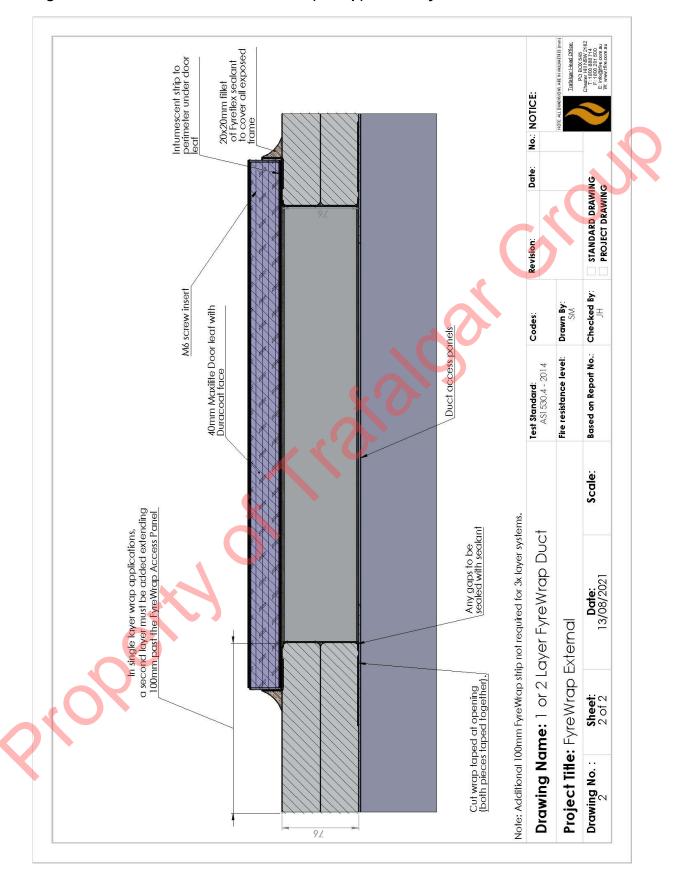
Access Panel Section View 1 (+ strip) and 2 Layer
